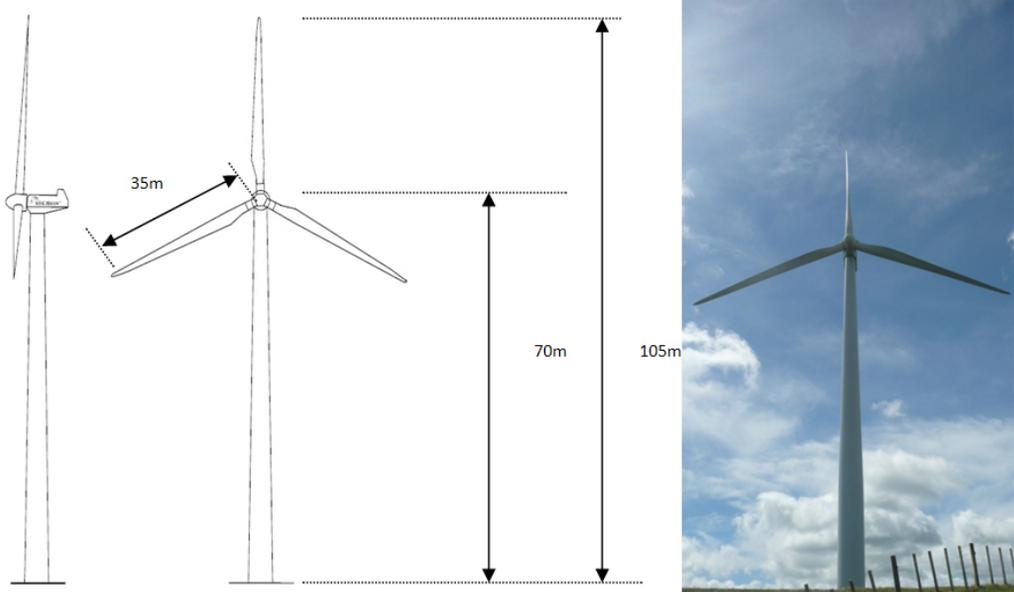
Technical drawing of front and side elevations of Wind Turbine Generator with key dimensions of Vestas V72 [blade length and heights].
